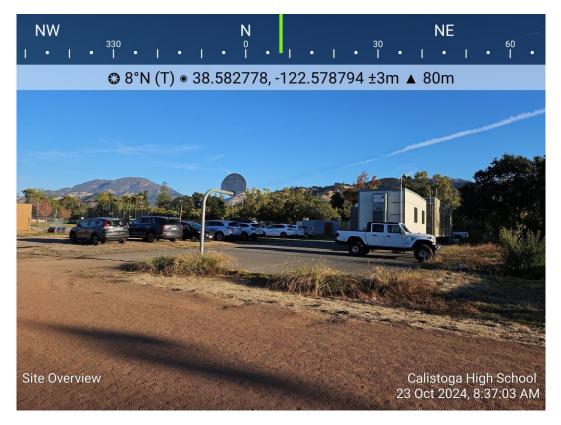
Photograph of the basketball court with portable buildings and storage containers, facing north.
